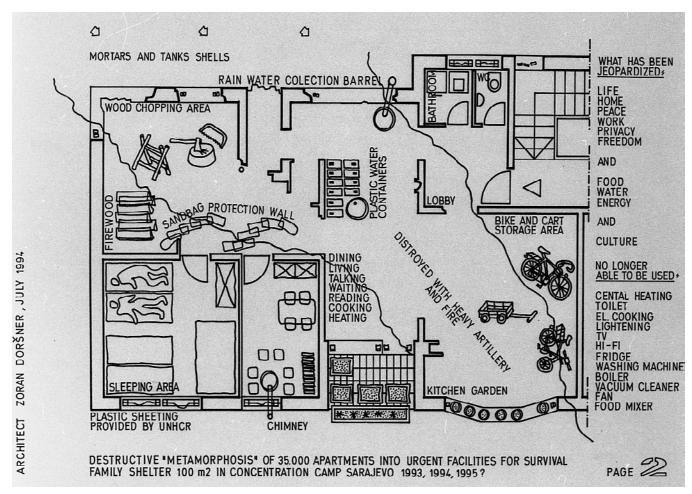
A typical Sarajevan apartment floorplan wartime transformation; Drawing: Zoran Doršner.
